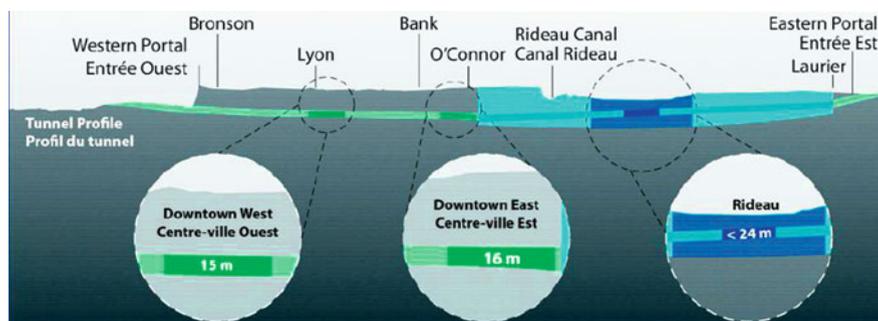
Proposed tunnel section of extension to OLRT (from OLR 2012)
